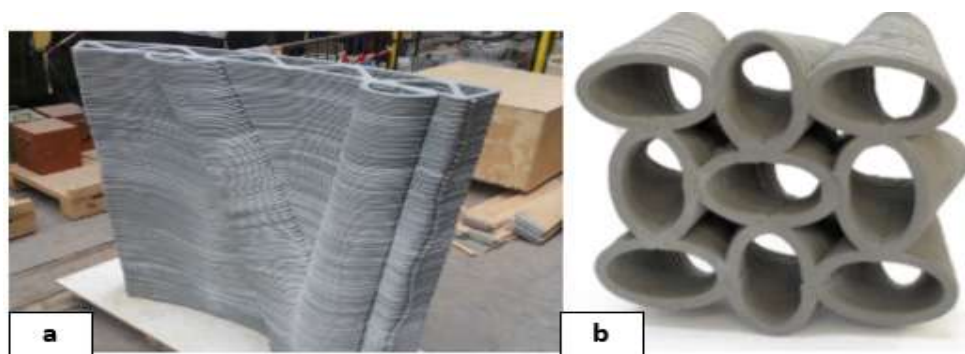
Structural wall elements. (a) Multifunctional wall element, (b) acoustic-dampening wall element [97].
